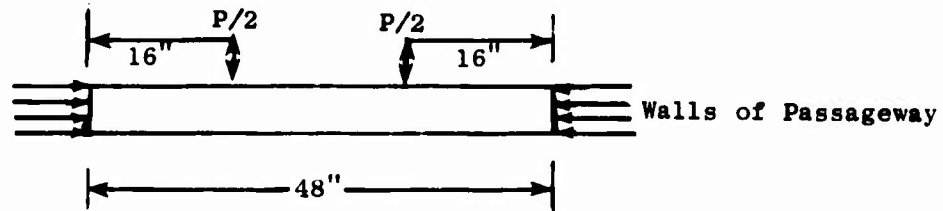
Test Method for Brick and Concrete Block Arched Beams.
